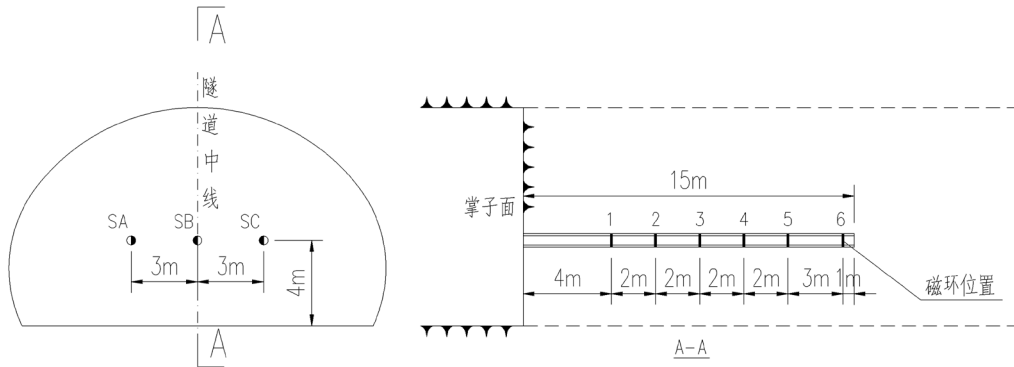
Layout of extrusion monitoring points in front rock of tunnel
